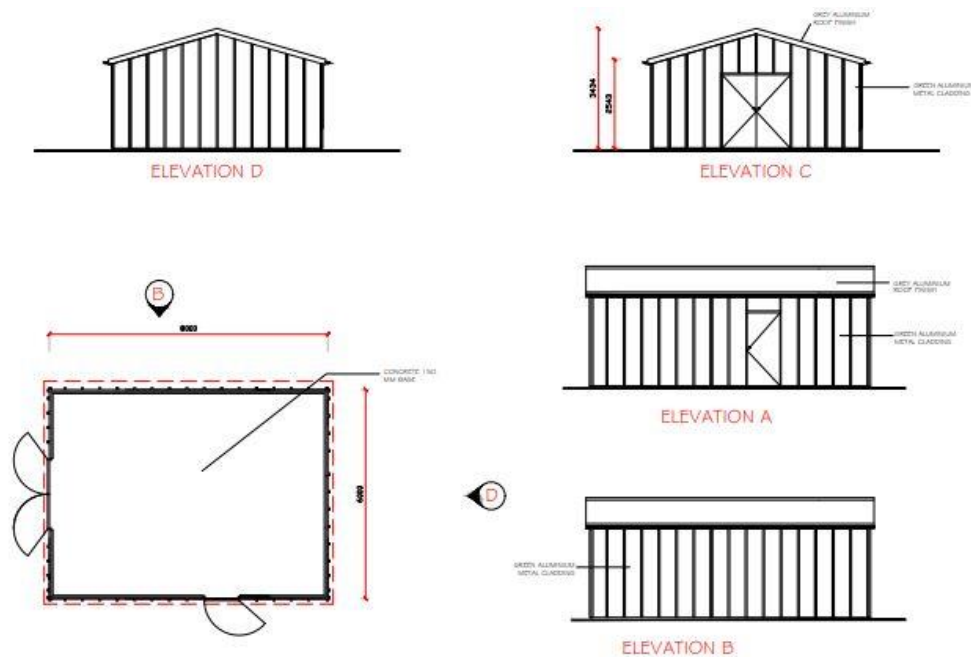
Proposed storeroom floor plan and elevations – current application (23/02527/FULL1).
